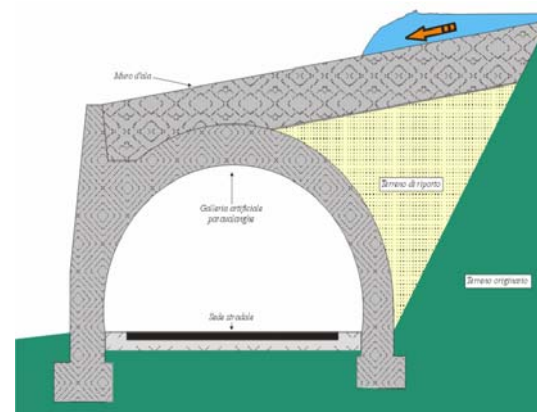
Scheme of an avalanche tunnel [Sommavilla, 2006].
